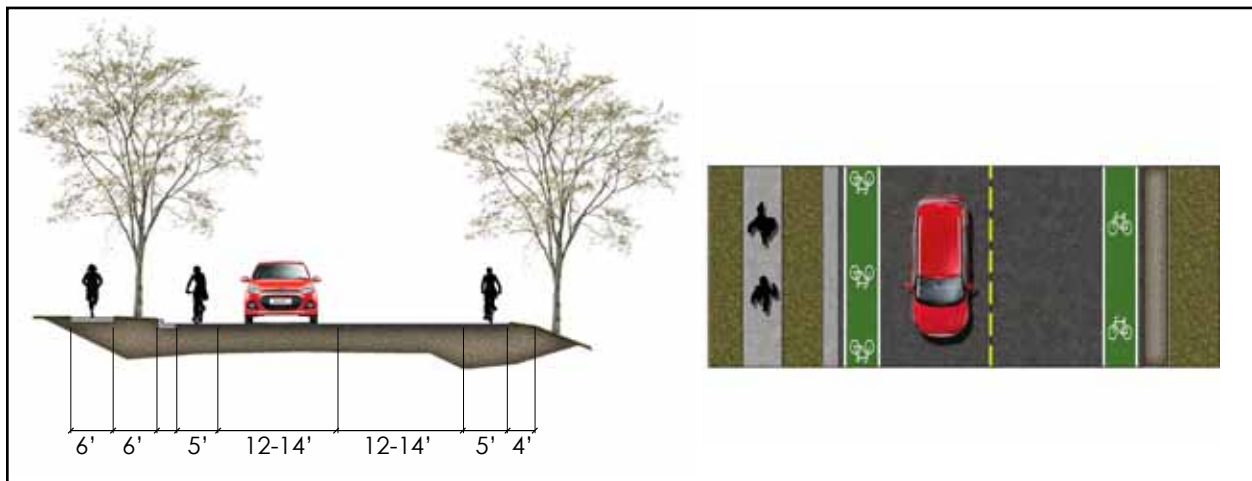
Typical cross section (left) and plan view (right) of a striped bike lane.
